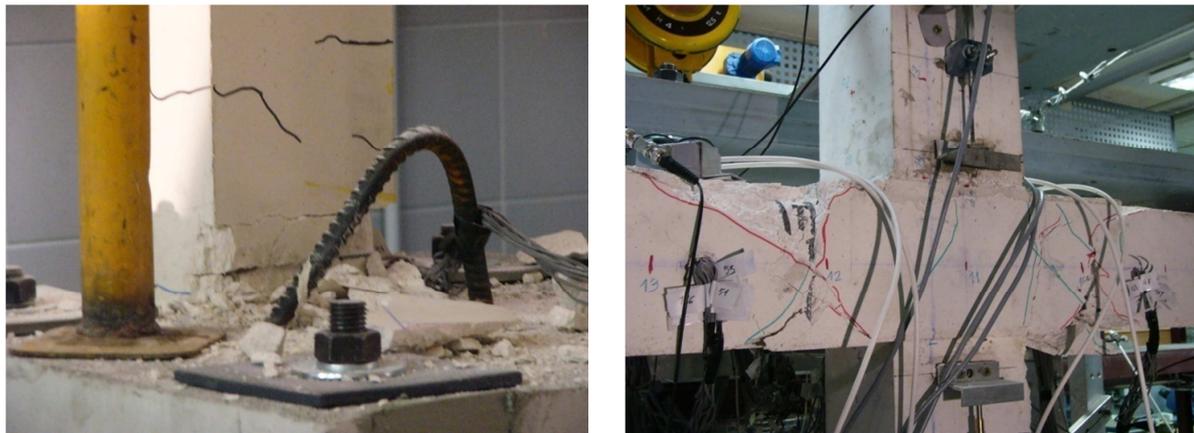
C350 damages: (a) base of exterior column; (b) spandrel beam
